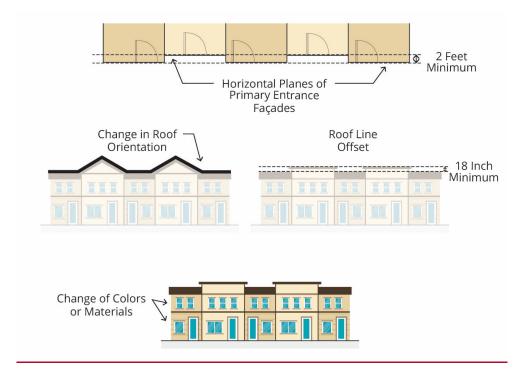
F TOWNHOMES AND ROWHOUSES, UNIT ARTICULATION
